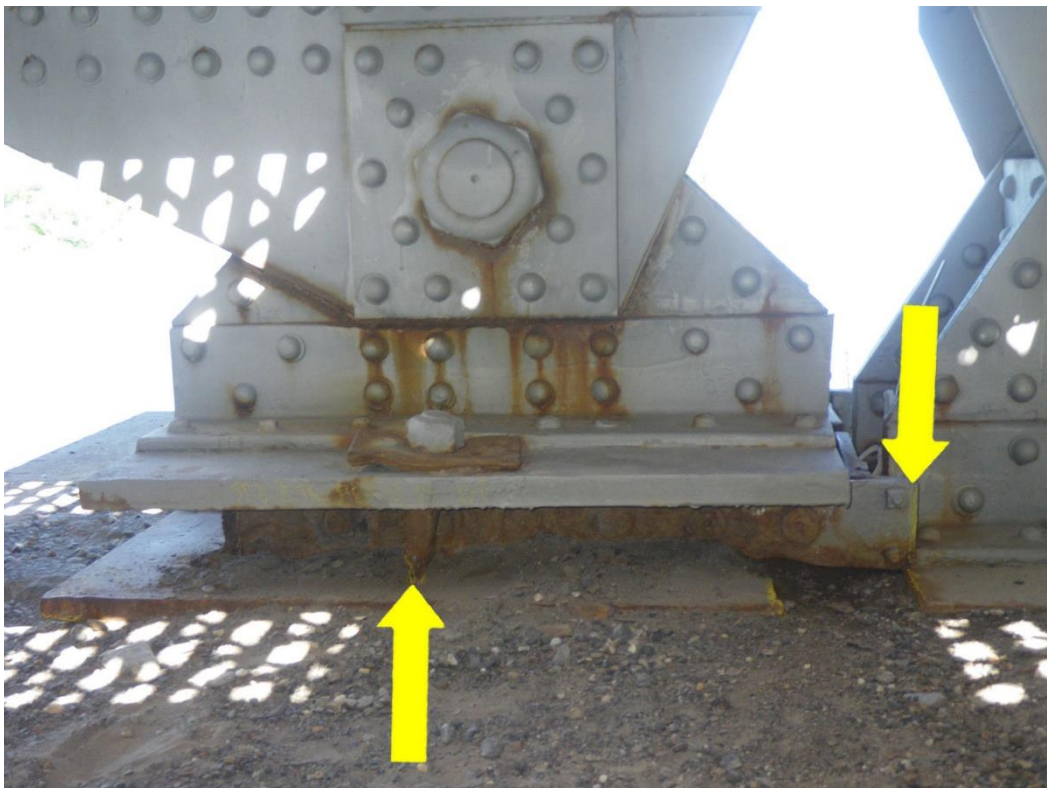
East Truss Bearing at Pier 3, West Face, Span 3 - Nested roller assembly expanded beyond the masonry plate edge and in contact with adjacent fixed bearing. Note anchor bolt severely bent with section loss.
